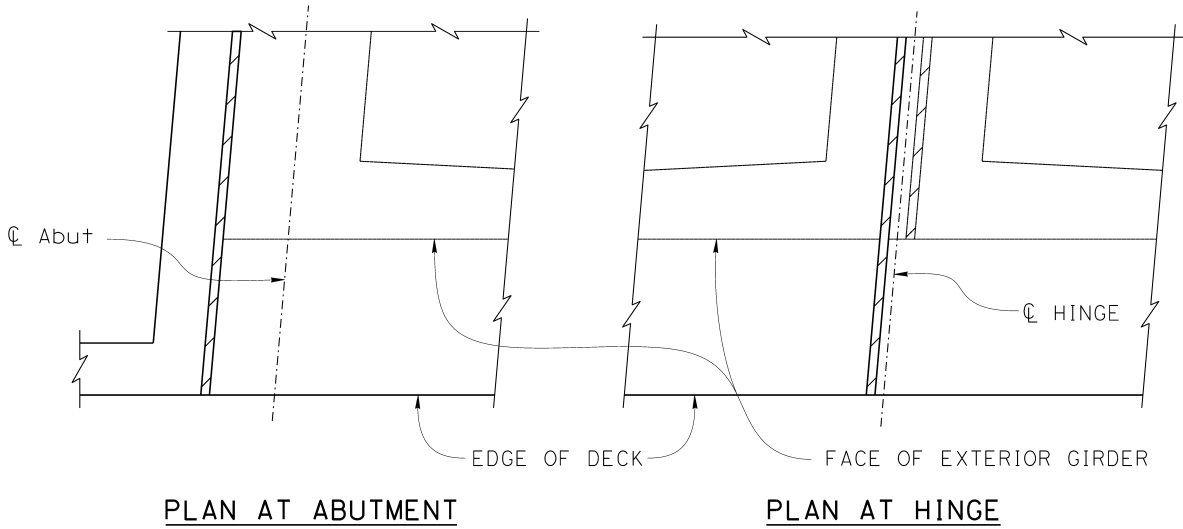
Deck Joints at Vertical or Sloping Exterior Girders (Skew 0° to 20°)
